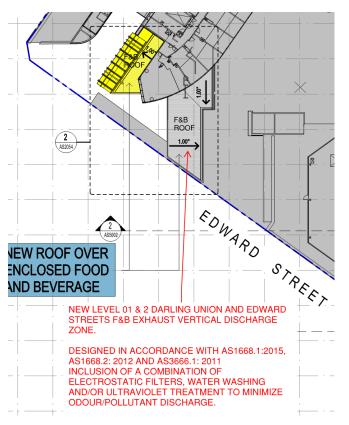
Level 03 Plan view - New Darling Union and Edward Streets F&B exhaust discharge location.
